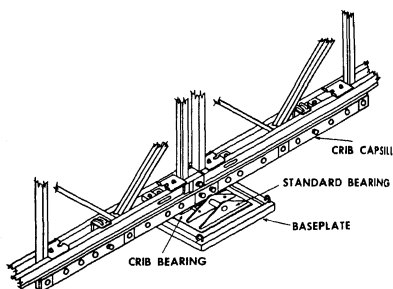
Rocker bearing to support two panel support points made from crib capsill, crib bearing, and standard bearing.
